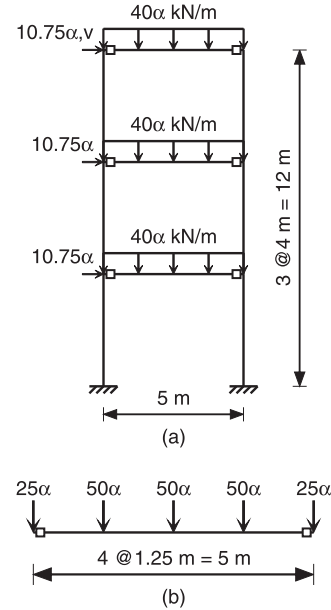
Example 2: 3 story portal frame: (a) structure and loading and (b) beam discretization.
